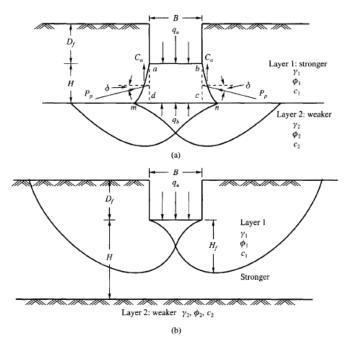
Failure of soil below strip footing under vertical load on strong layer overlying weak deposit (after Meyerhof and Hanna, 1978)
